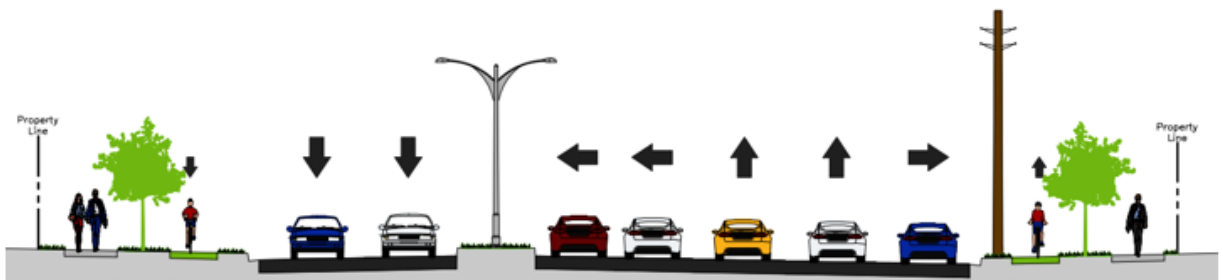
Preferred Richmond Street Cross-Section, South of Fanshawe Park Road (Looking North)
